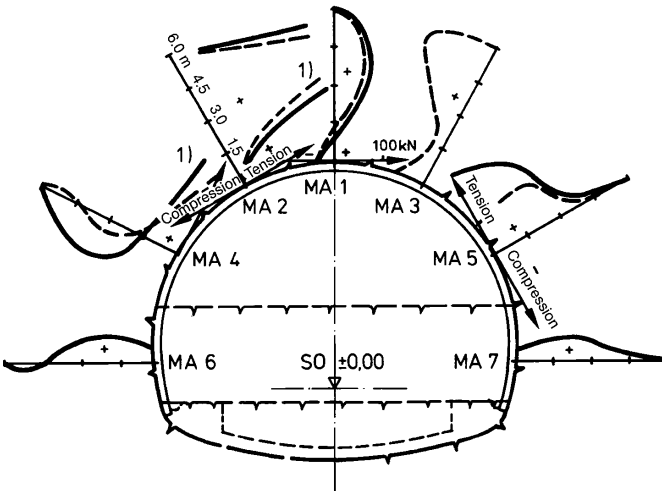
Readings from mechanical measurement anchors for the determination of the anchor loading at the Landrücken Tunnel (measurement anchors MA 1 to 7).
